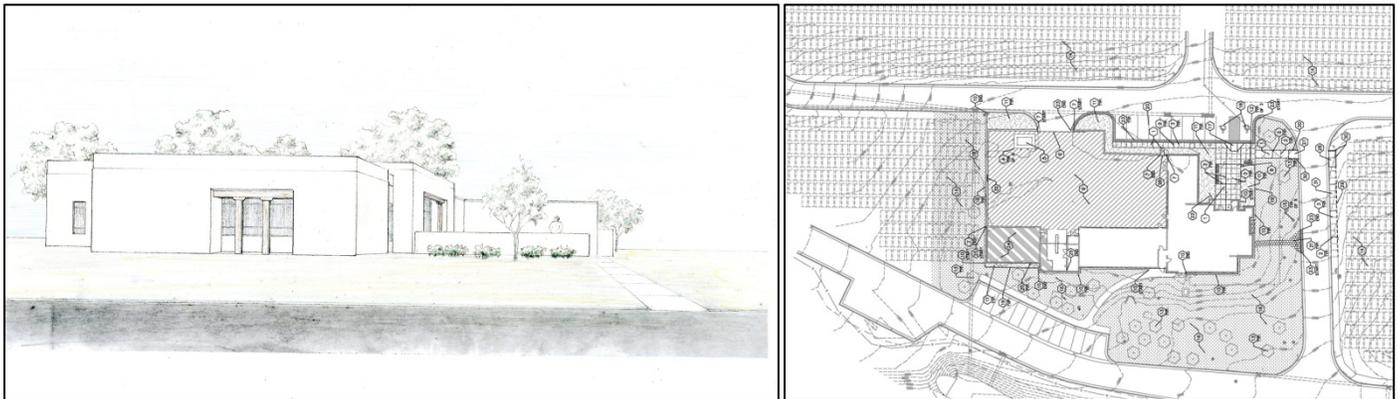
Sketch of south elevation, and a planting plan that shows the footprint of the renovated Administration Building, National Cemetery Administration.
